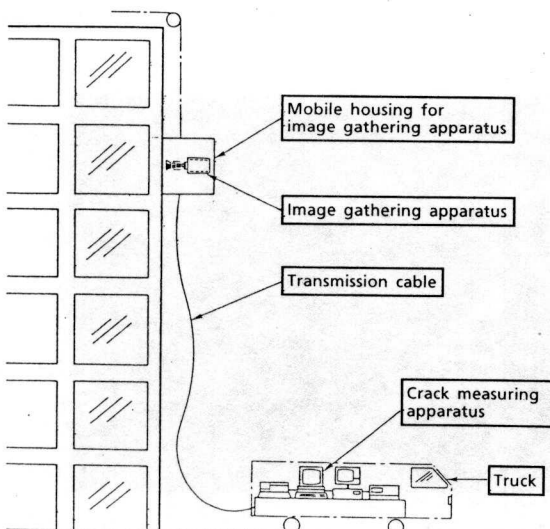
Components of Concrete Crack Measuring Work
